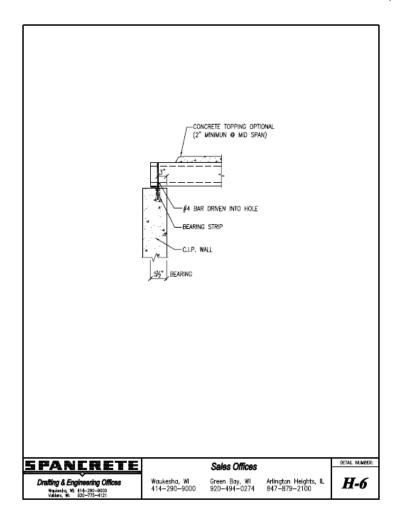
Spancrete Typical Hollow Core Plank to Precast Wall Detail
